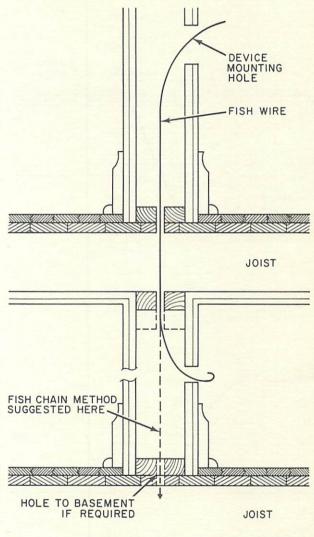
Gaining Access From Second Floor Wall to First Floor Wall.
